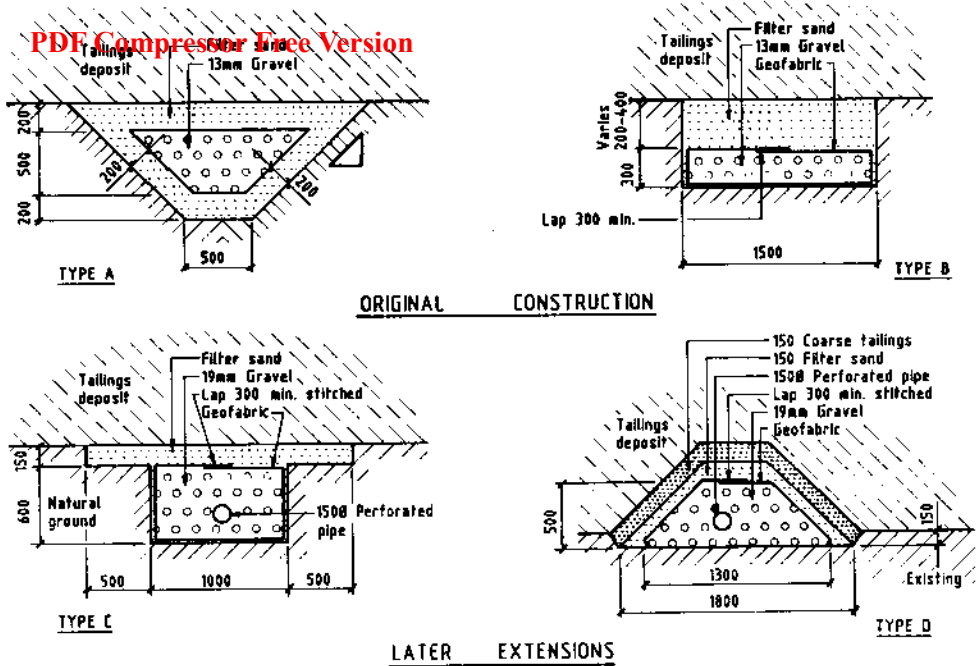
Use of geotextiles as underdrains in tailings dams in South Africa (Scheurenberg 1982).
